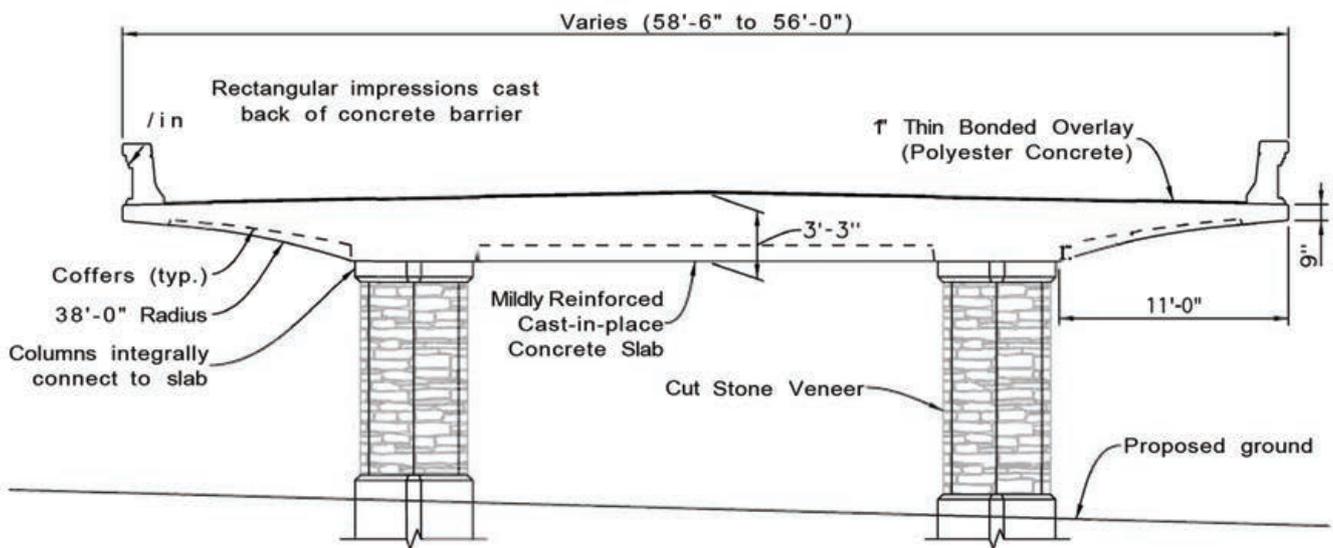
Typical cross section of unit 2 of the Grand Avenue Bridge. Figure: RS&H.
